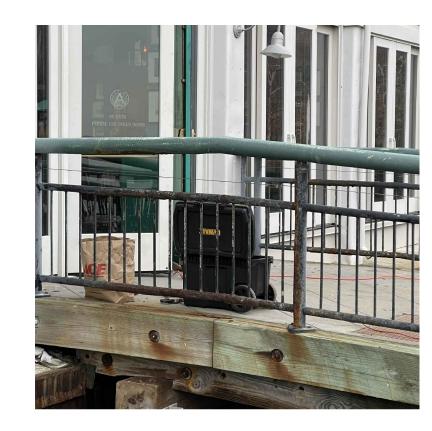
OPEN AREA #7 CORRODED HANDRAIL
